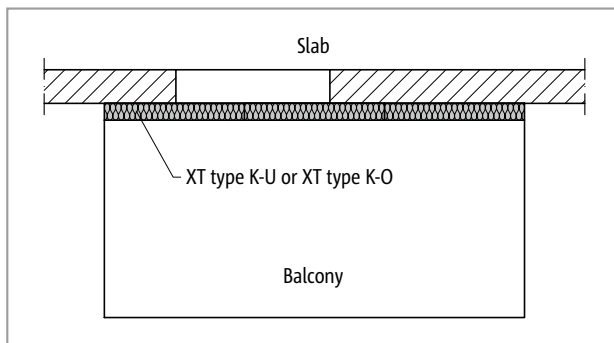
Schöck Isokorb® XT type K-U/K-O: Cantilevered balcony
